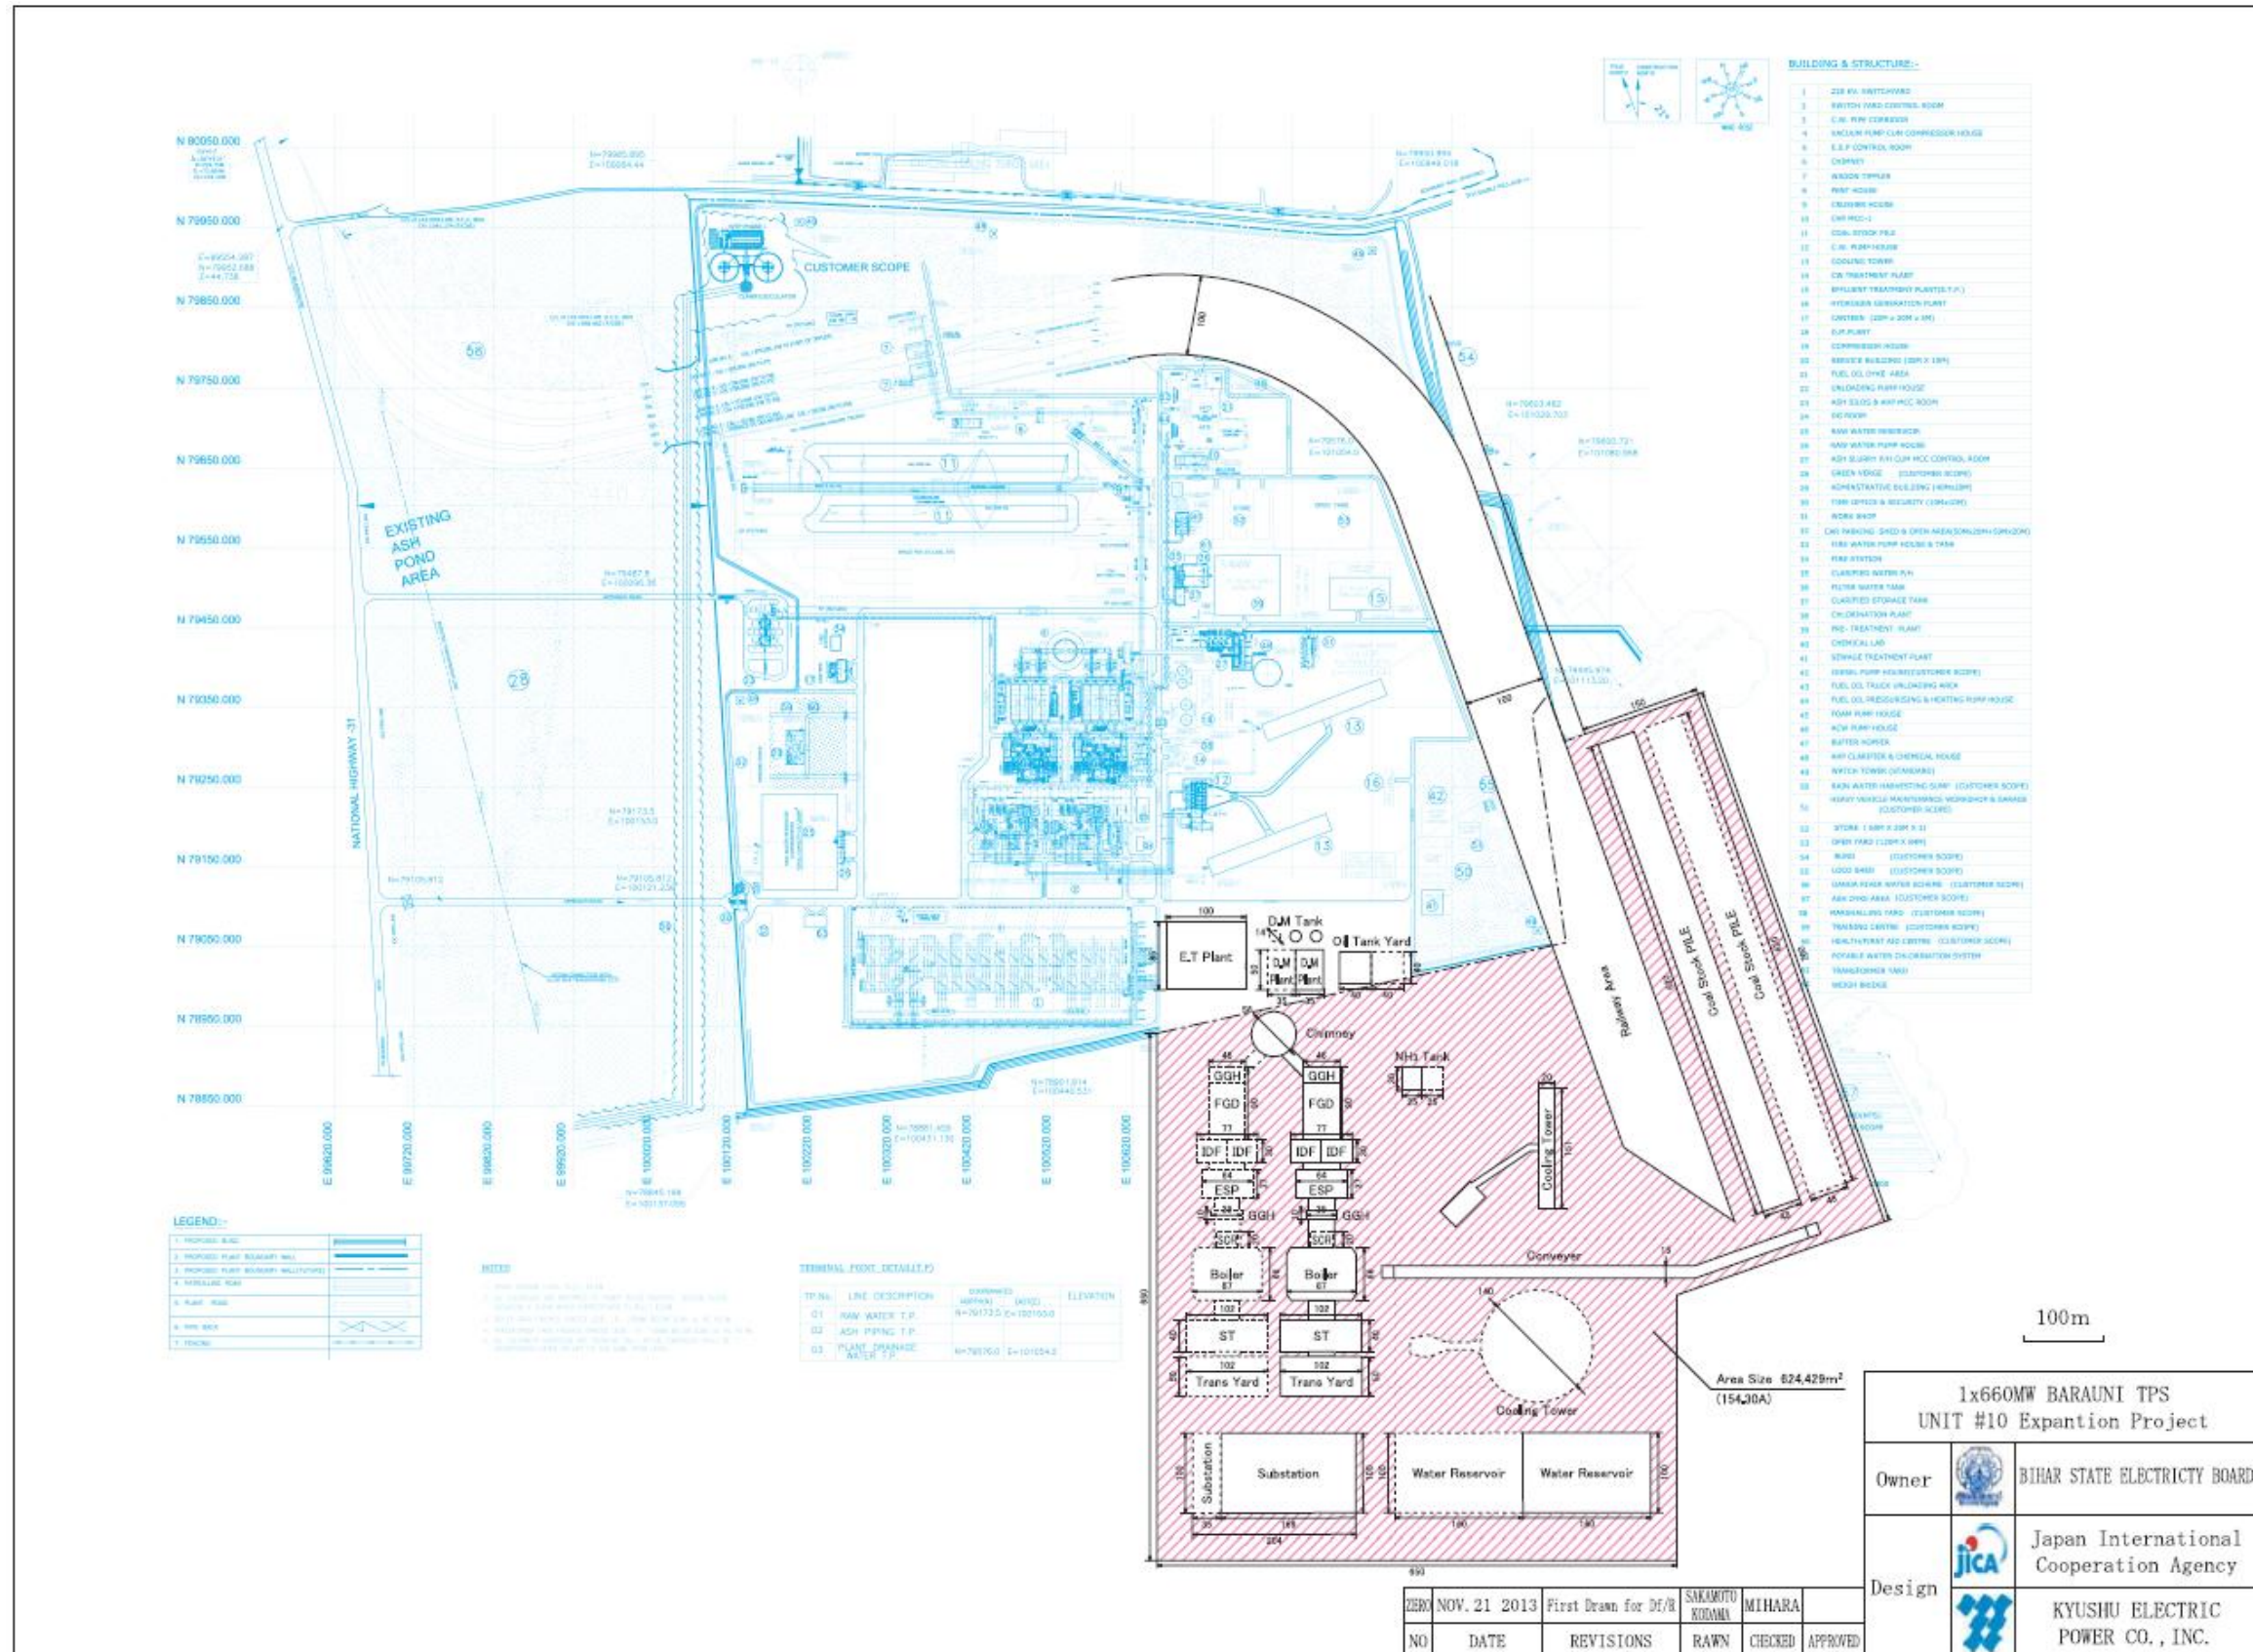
Configuration Adopted in Japan at Site in the South Adjacent to Units No.8/9 (CONSTRUCTION POSSIBLE)
